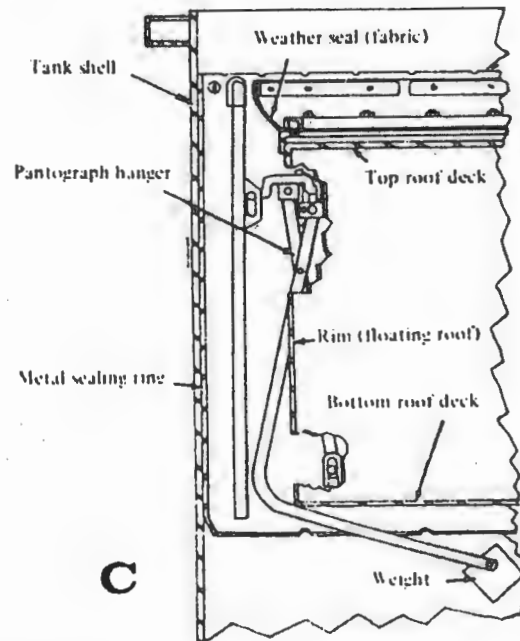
Typical Seals Used With Floating Roof Storage Tanks.
